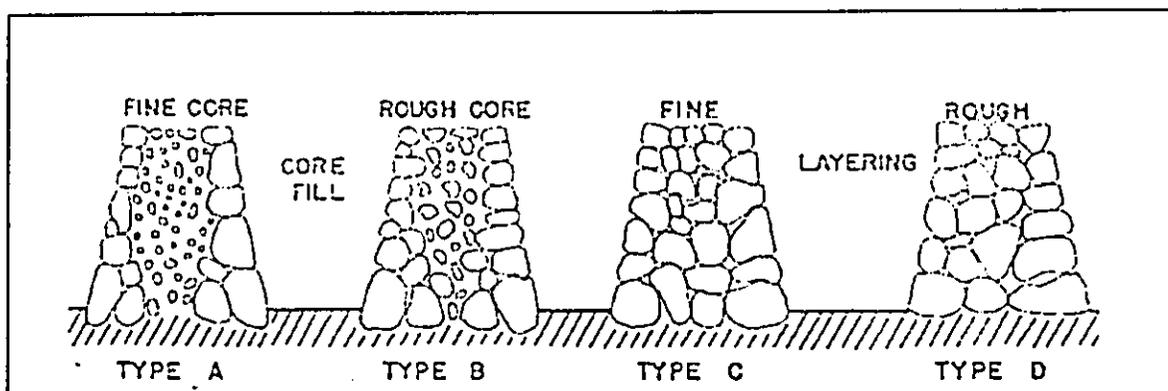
Cross-sections of double-wall construction with fill (Kikuchi 1976).
